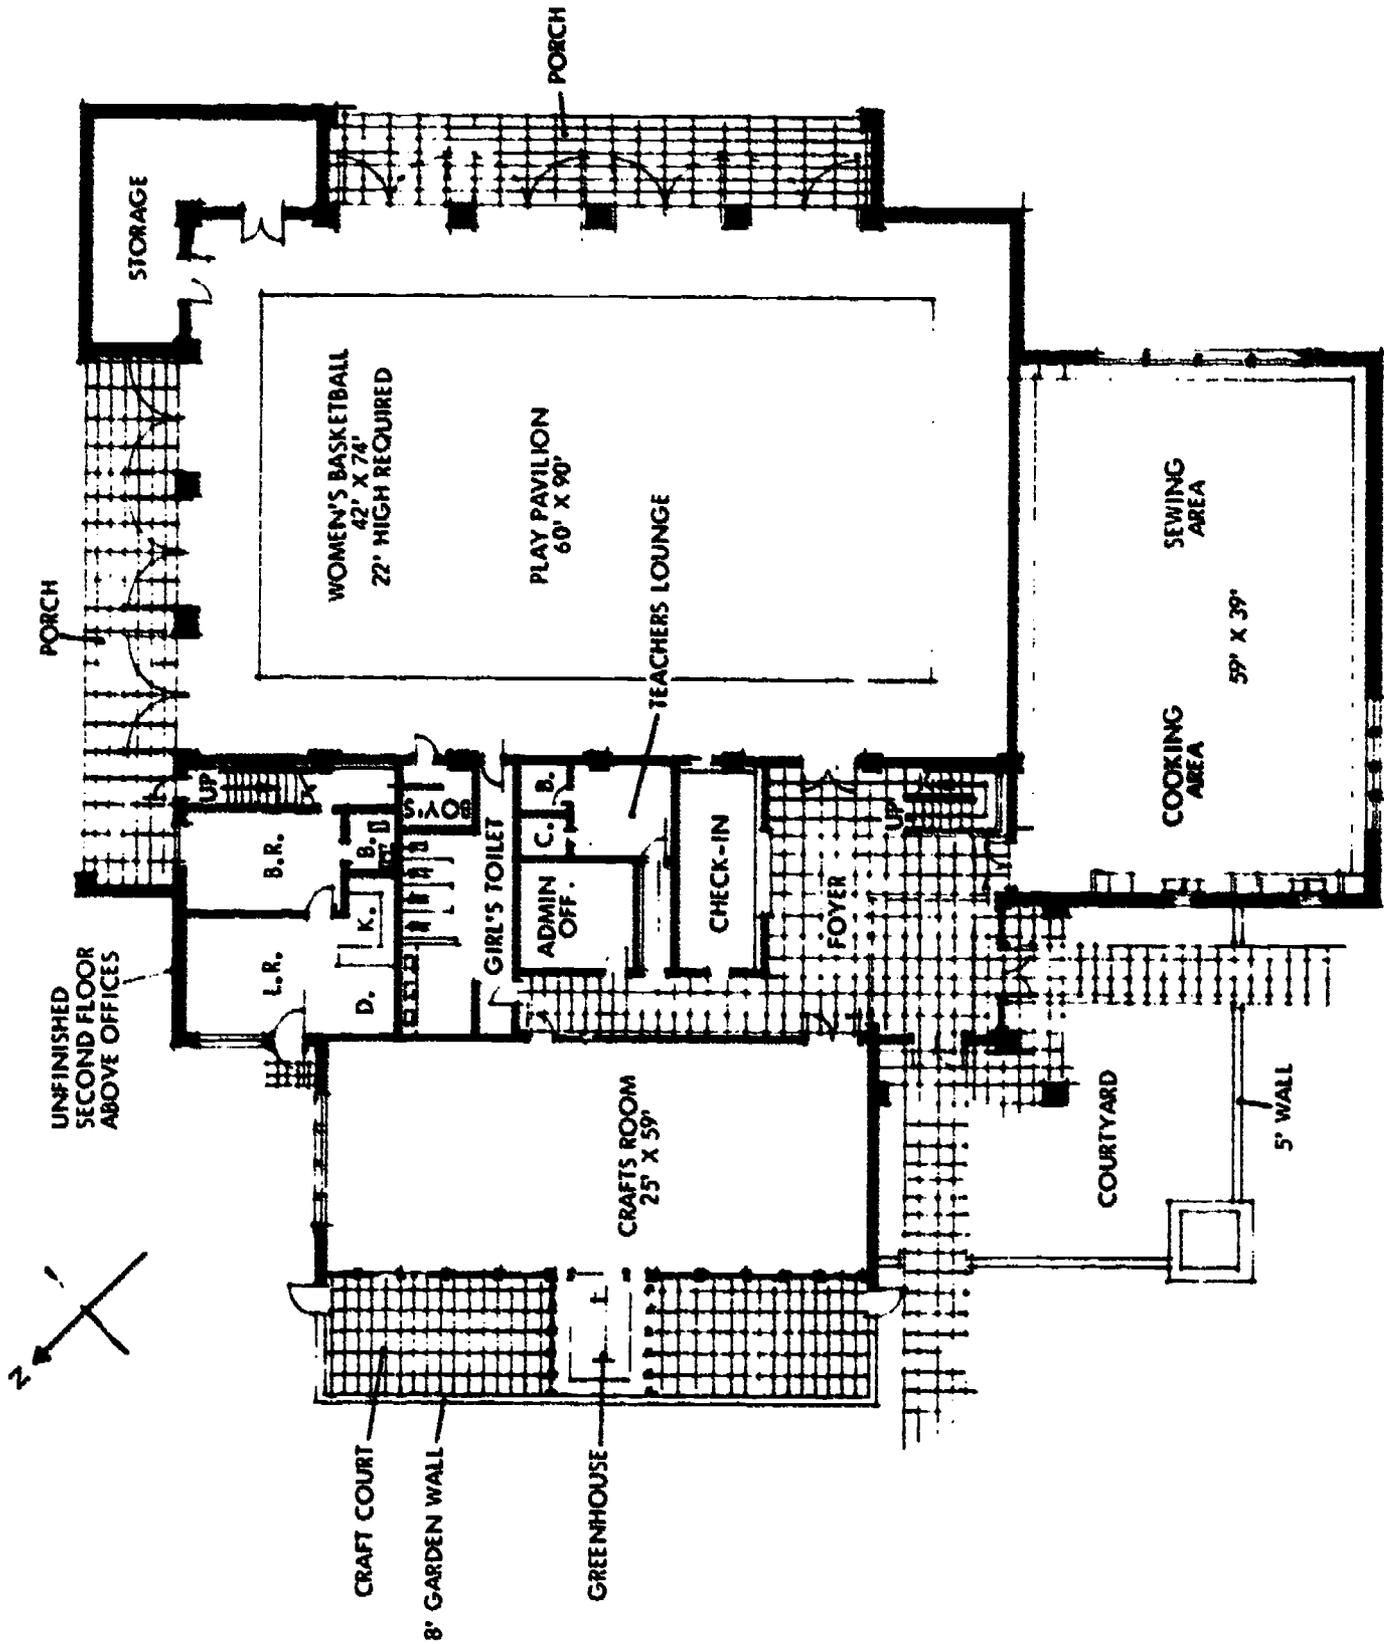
Floor Plan of Scottsdale Girls' Club South
